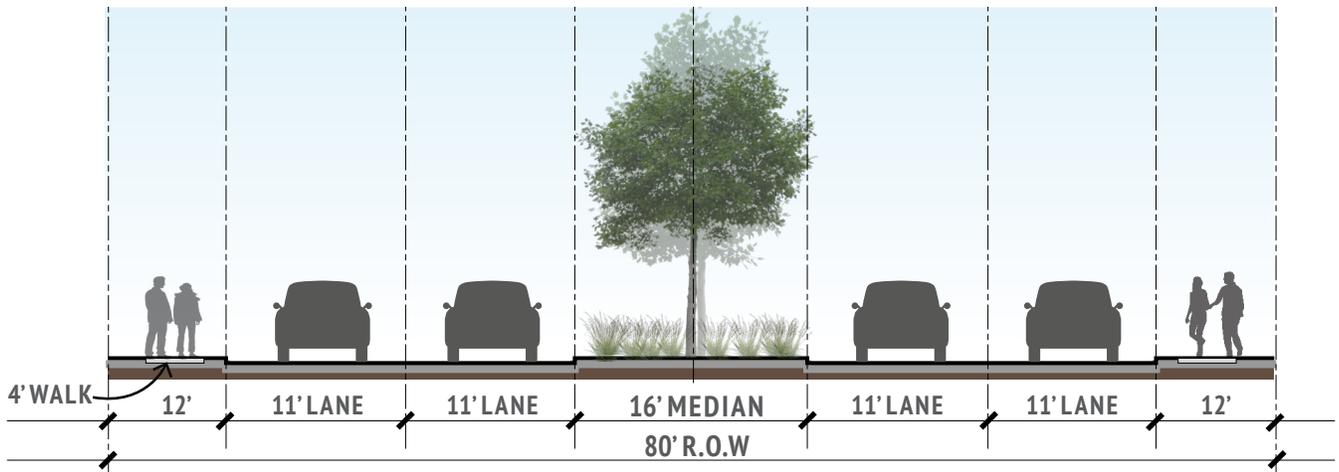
■ TYPICAL SECTION - STREET TYPE A
